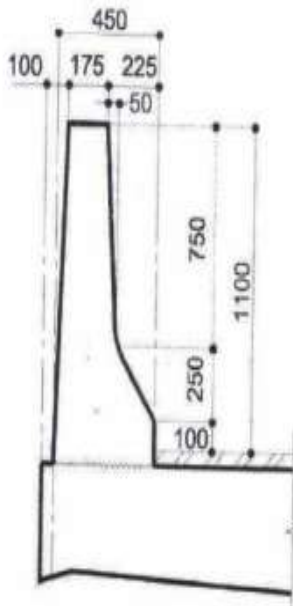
Details of Crash Barrier for Bridges without Footpath
